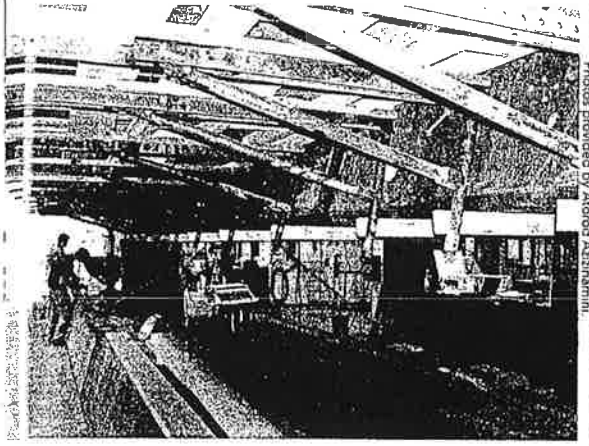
Conventional forming materials and methods can be used to form the concrete deck on the folded plate girder.
